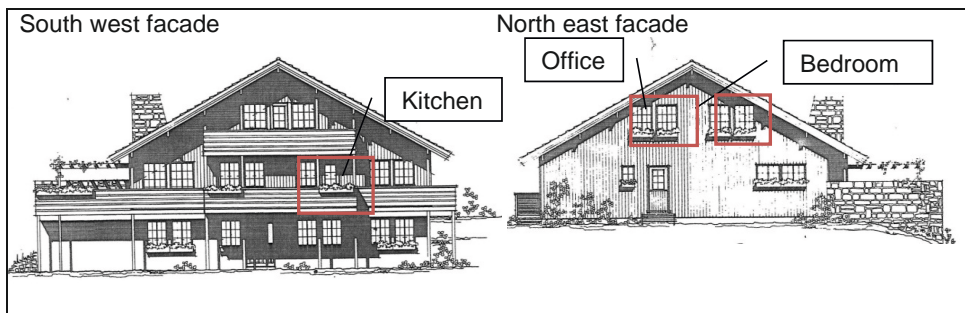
The southwest and northeast oriented facades of the as built Block 180
